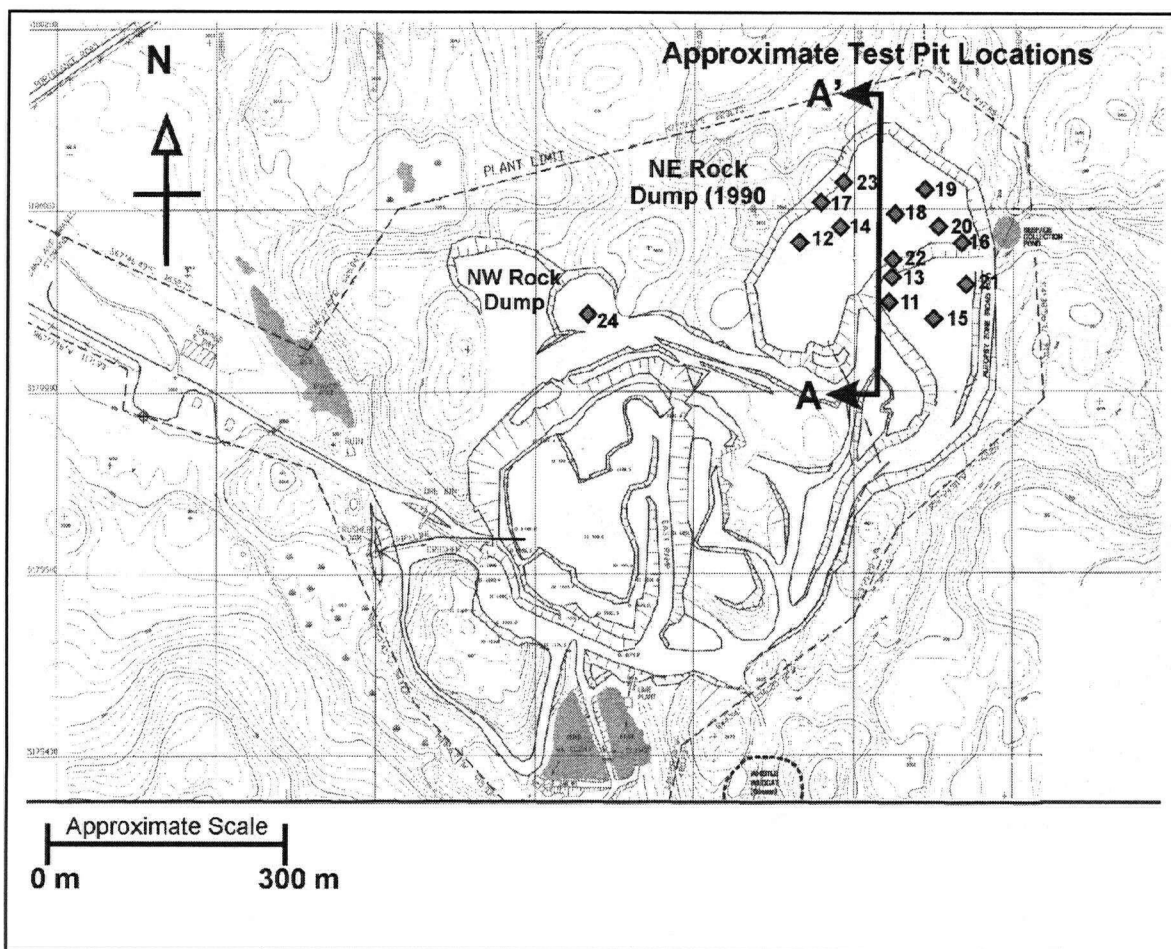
Plan View of Site 2 showing original topography and Test Pit Locations.
